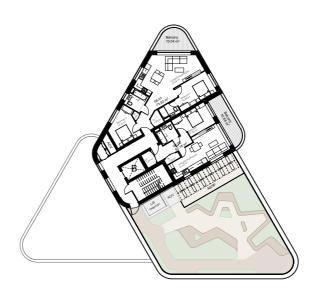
8th floor plan (not to scale). Source: Stockwool.
